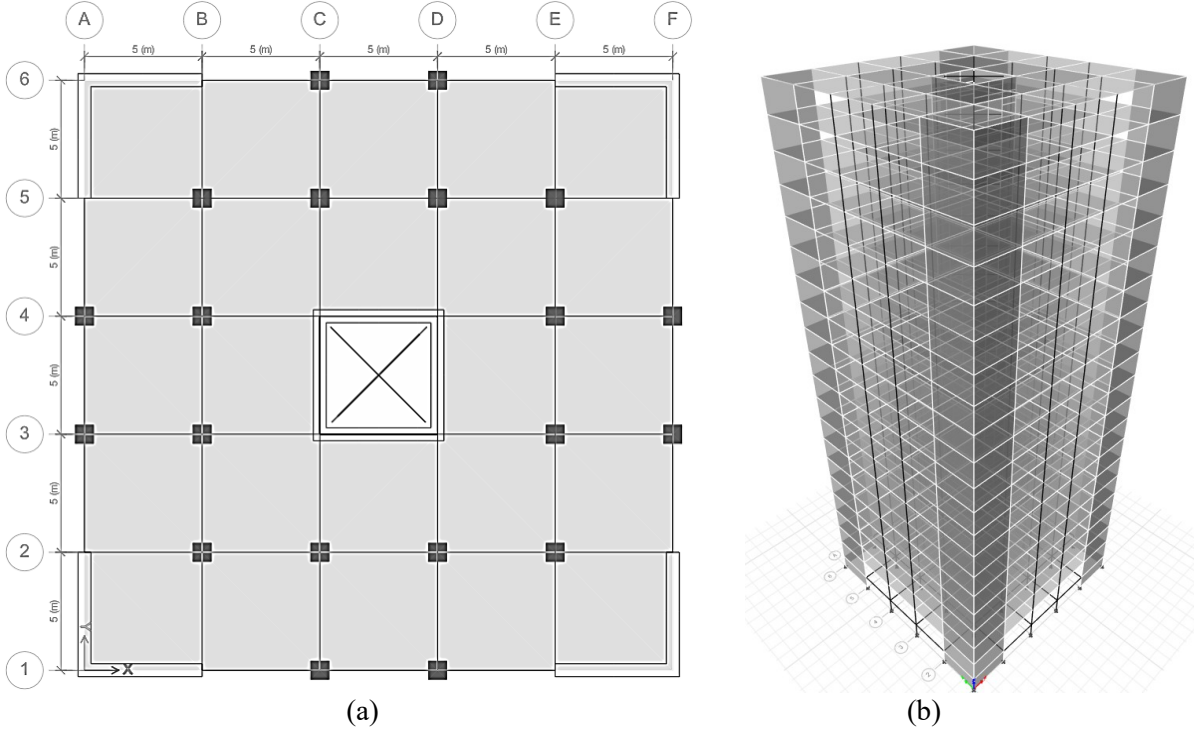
(a) Plan view of a typical floor and (b) Three-dimensional view of the modelled building
